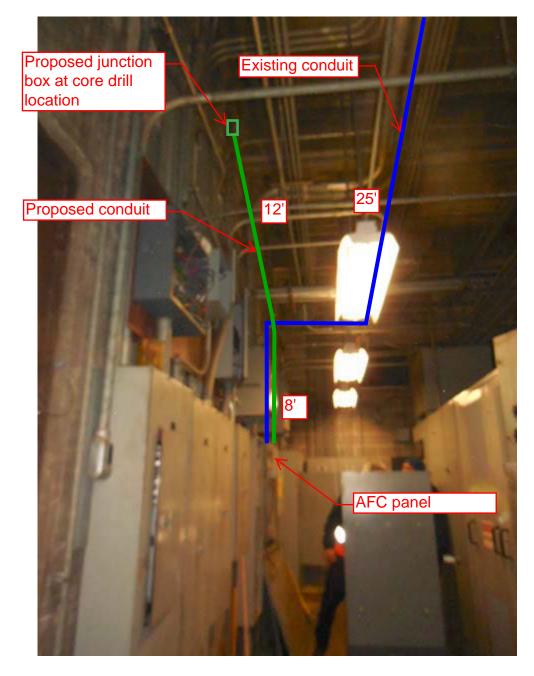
Existing and proposed conduits to AFC Panel in AC Switchboard Room 107
